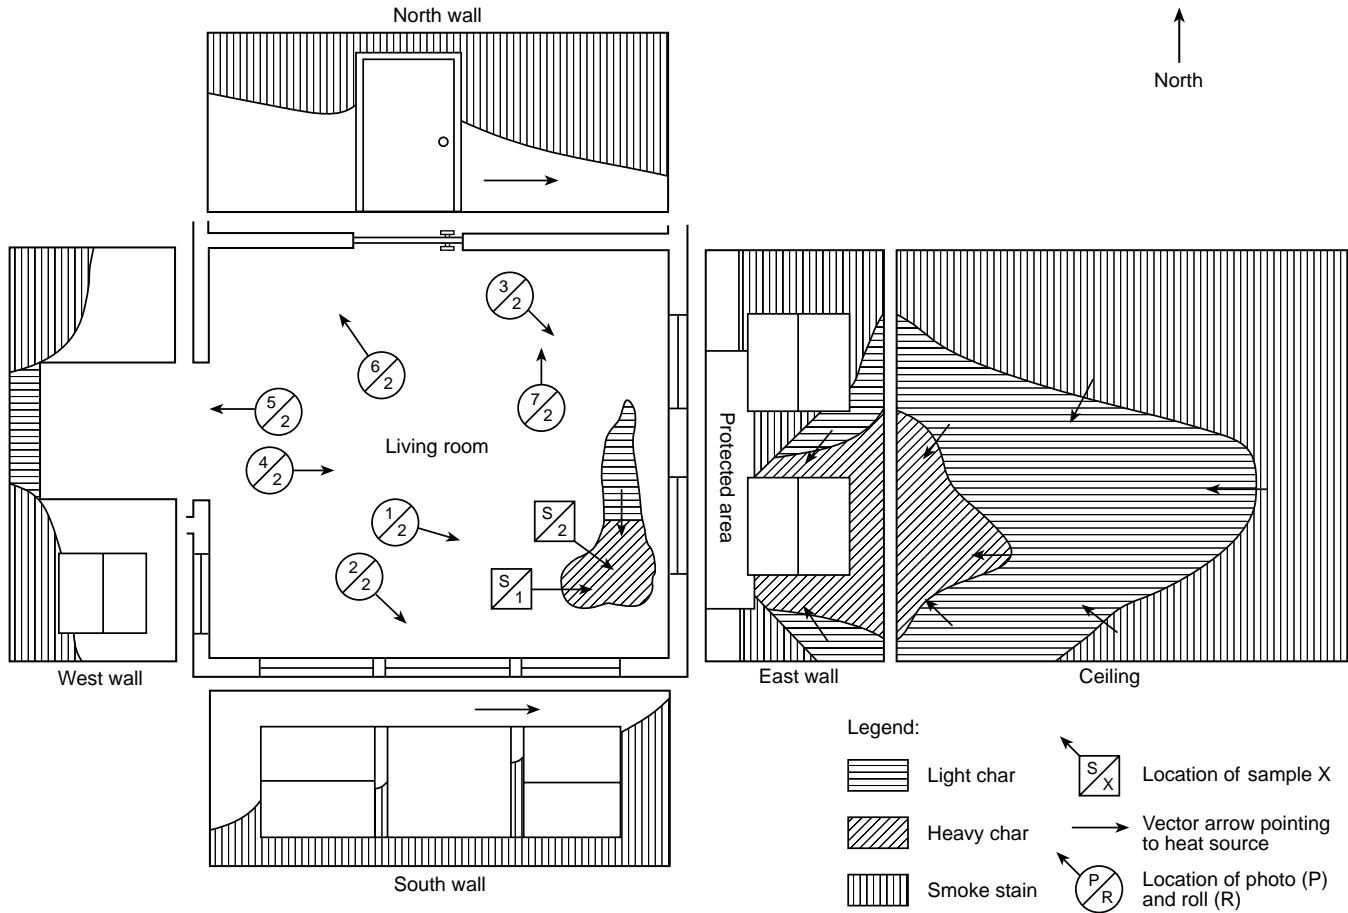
(b) Detailed floor plan.FIGURE 13.4.2(c) Pre-fire contents diagram.
